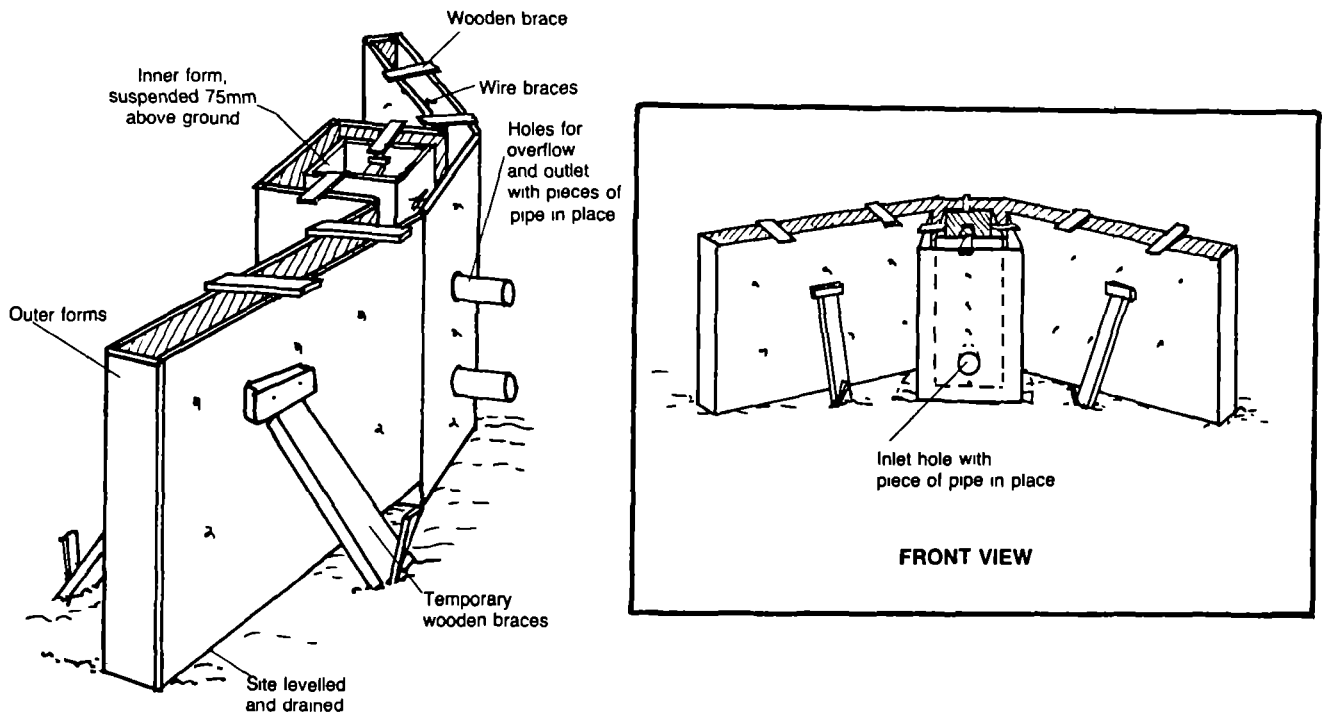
Forms for Anti-Seepage Wall and Collection Box
